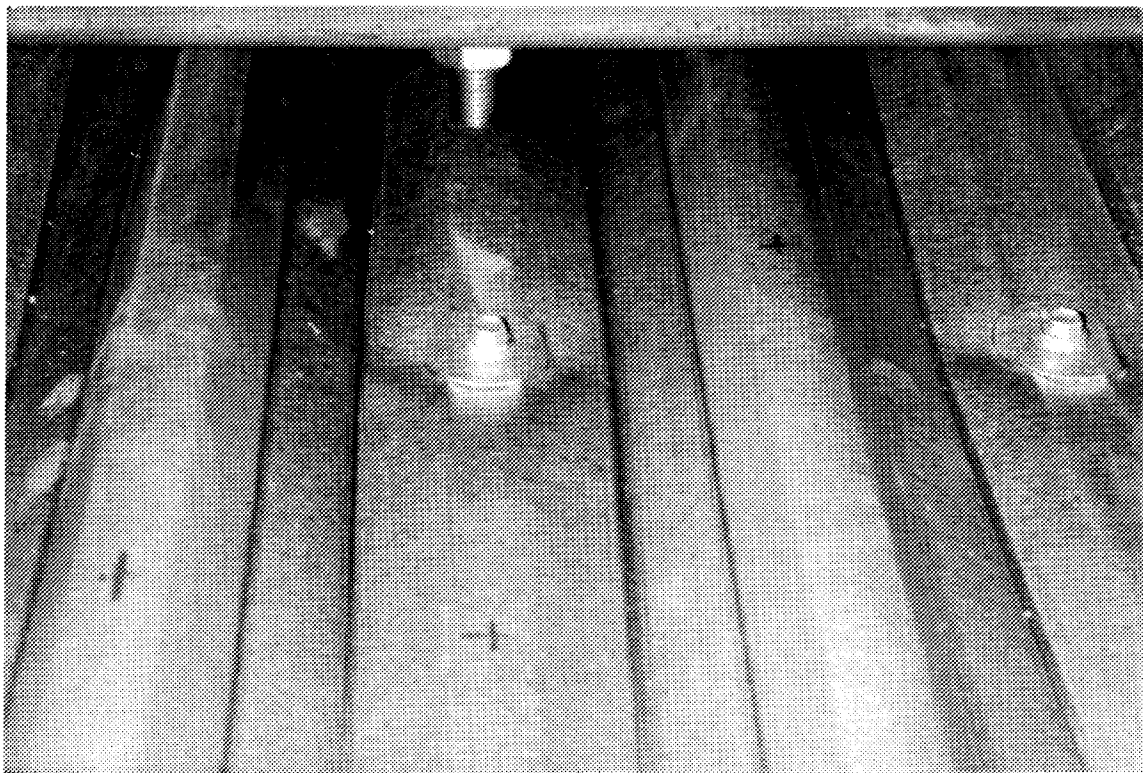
LARGE CROSS-SECTIONAL DISTORTION OF TRAPEZOIDAL TYPE ROOFING SHEET WITH CYCLONE WASHERS
